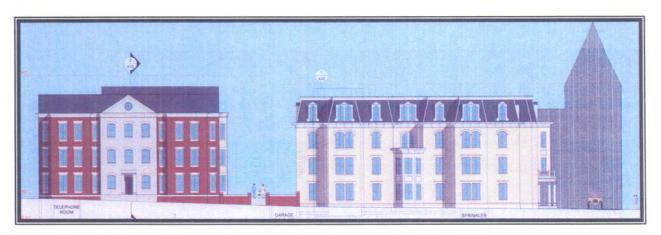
View of Montgomery Street Elevation as Annroved by BAR.
